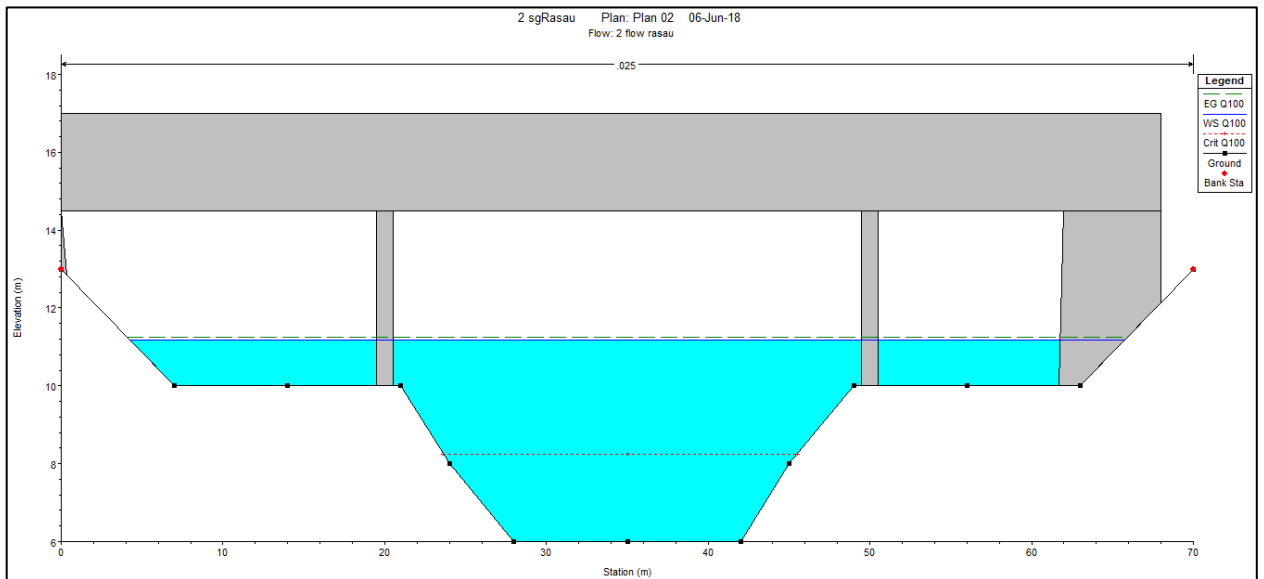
Water level at CH10 upstream of Rasau River (with bridge piers) – Q_{100}
